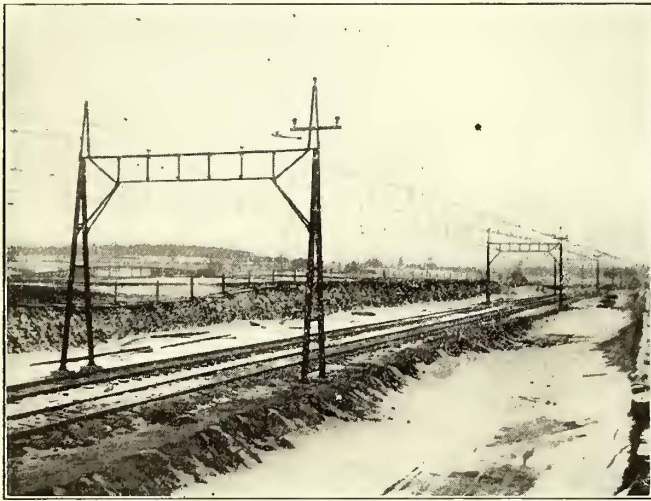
Power Distribution—Showing Light Type of Steel Bridge Supports Used in Catenary Construction
